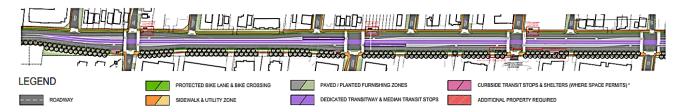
LAKESHORE ROAD EAST – ROLL PLAN EXCERPT (LAKESHORE CONNECTING COMMUNITIES TRANSPORTATION MASTER PLAN: CITY OF MISSISSAUGA / HDR)
